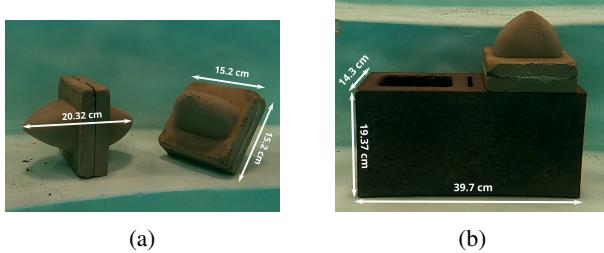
(a) Cone inserts. (b) Cone insert in block.
